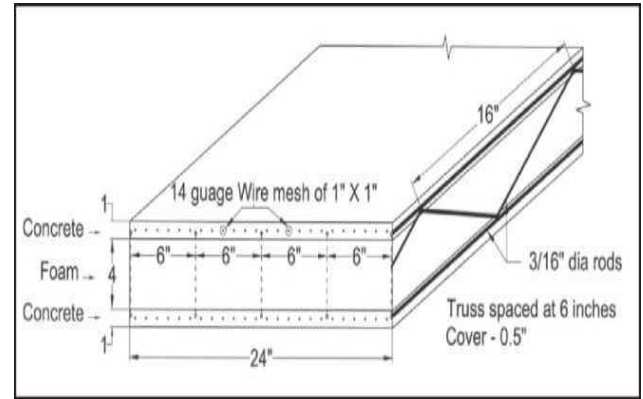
Dimensions and Reinforcement Details of Typical SCIP System
